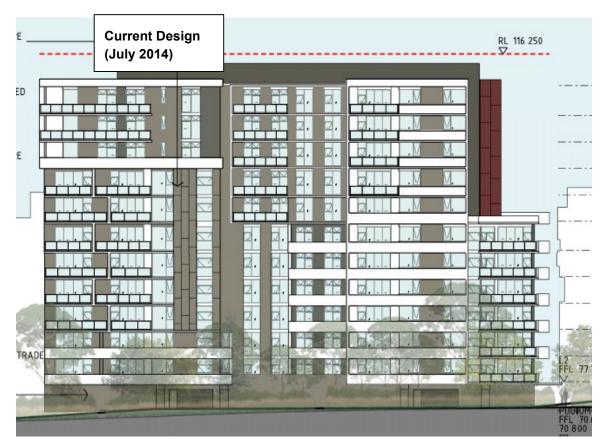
West Elevation of Building A (Adelaide) for the <u>Maquarie Park Village</u> development – comparison between current design and design previously assessed
